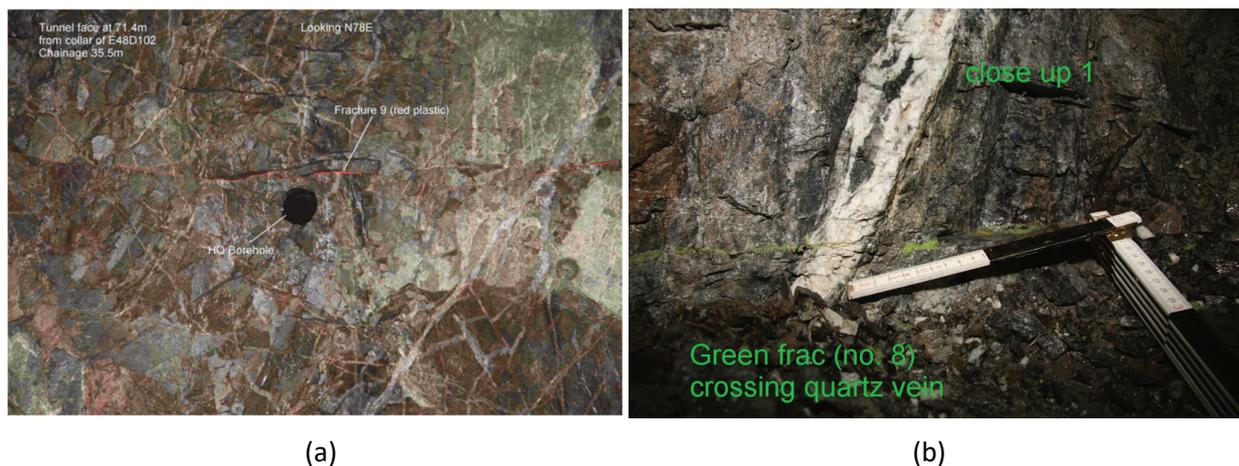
Hydraulic fracture cutting a shear zone in E48 drive (a) and cutting veins (b)
